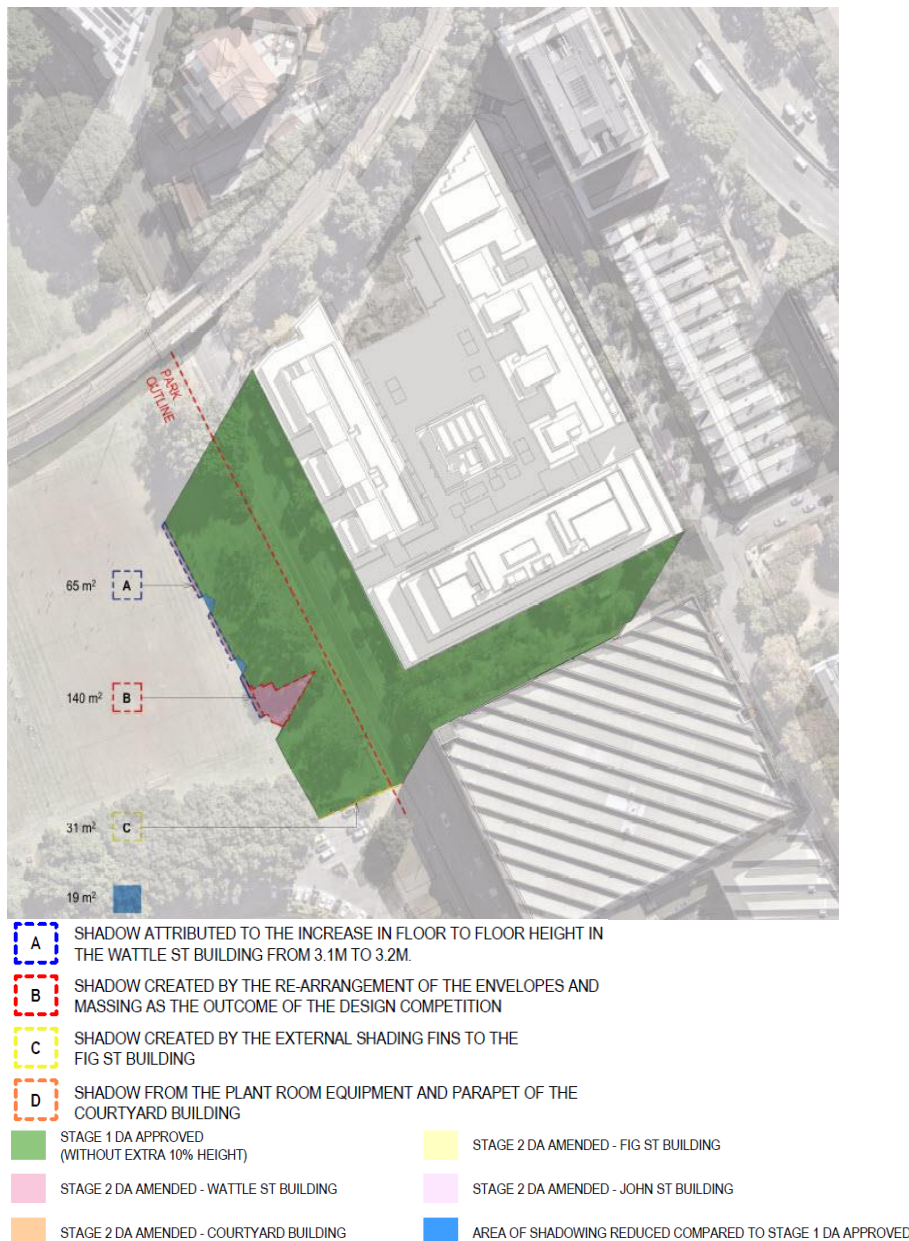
Building D - Wattle Street, Building C - Courtyard and Building E - Fig Street: Shadow diagram at 10am in midwinter
